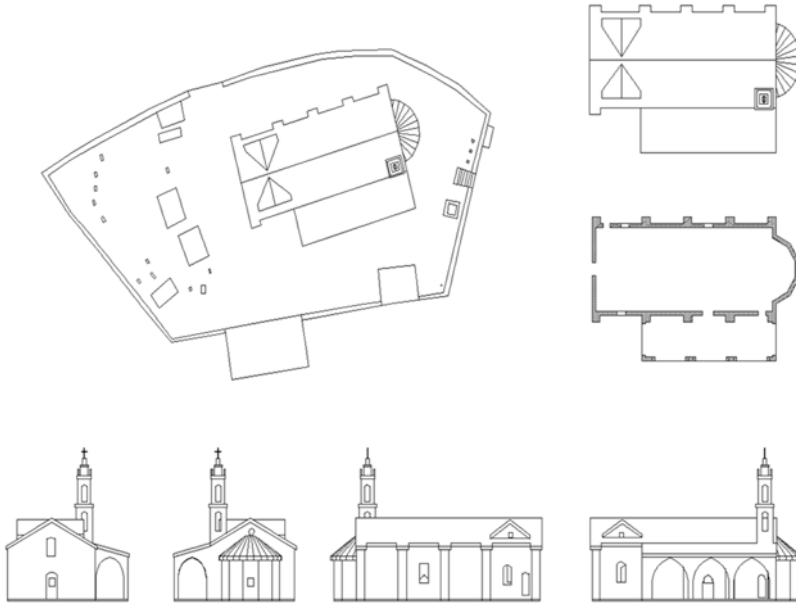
Drawings of plans and elevations extracted from the BIM model
